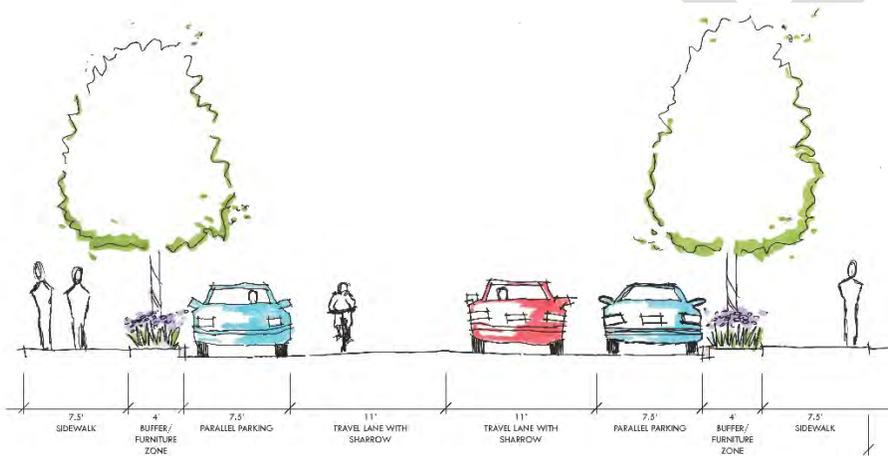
| Downtown District Recommended Typical Cross Section
